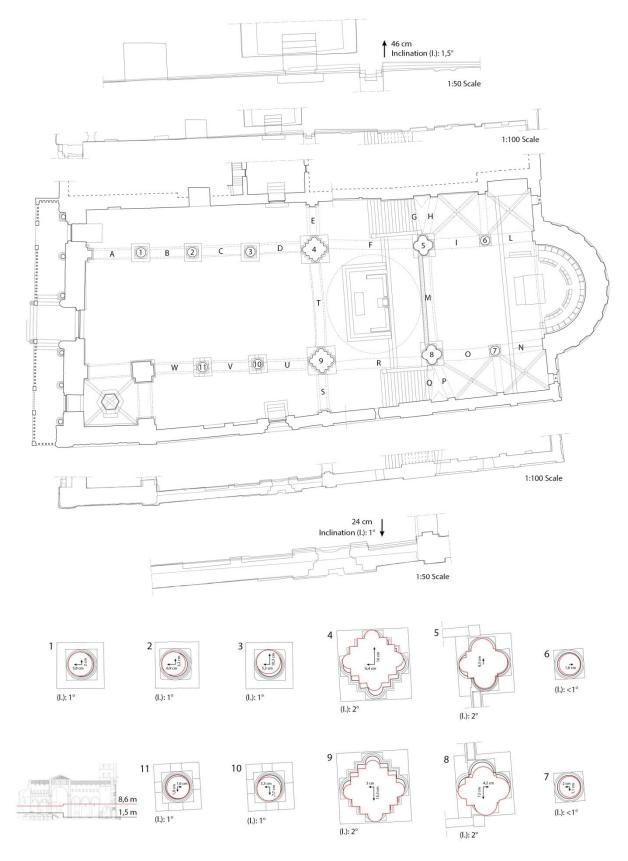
Plan of the church; we can see the maximun inclinations of the pillars and walls.
